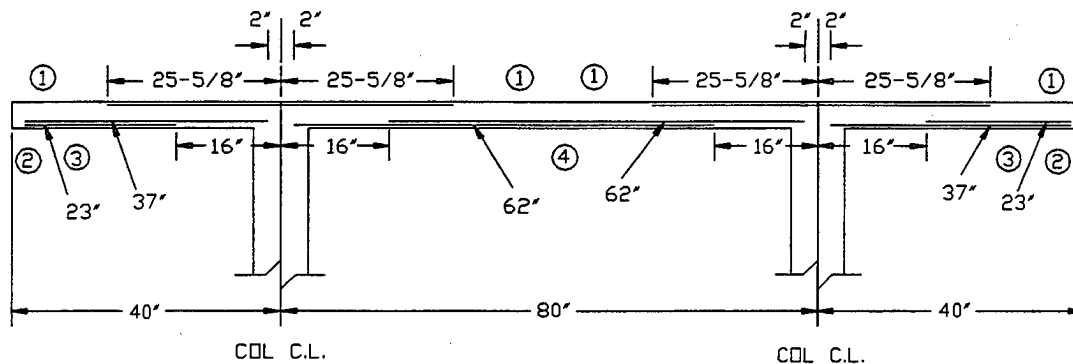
Lateral Reinforcement in Model Slabs, Bottom Bars
